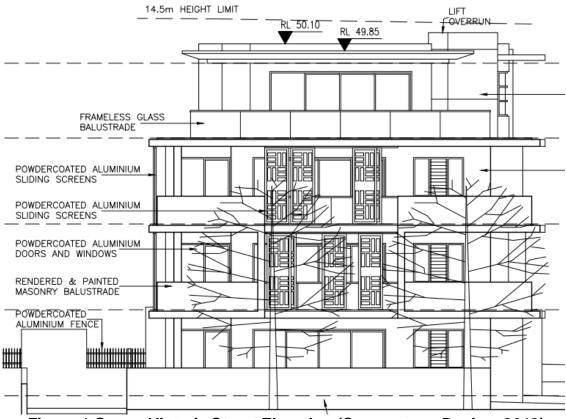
Queen Victoria Street Elevation (Cornerstone Design, 2018)
